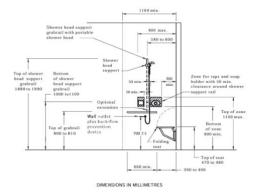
SHOWER RECESS FITTINGS-ELEVATION
